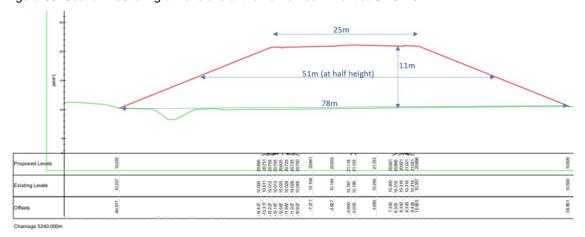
Section illustrating dimensions of the new embankment at Ch.5240
